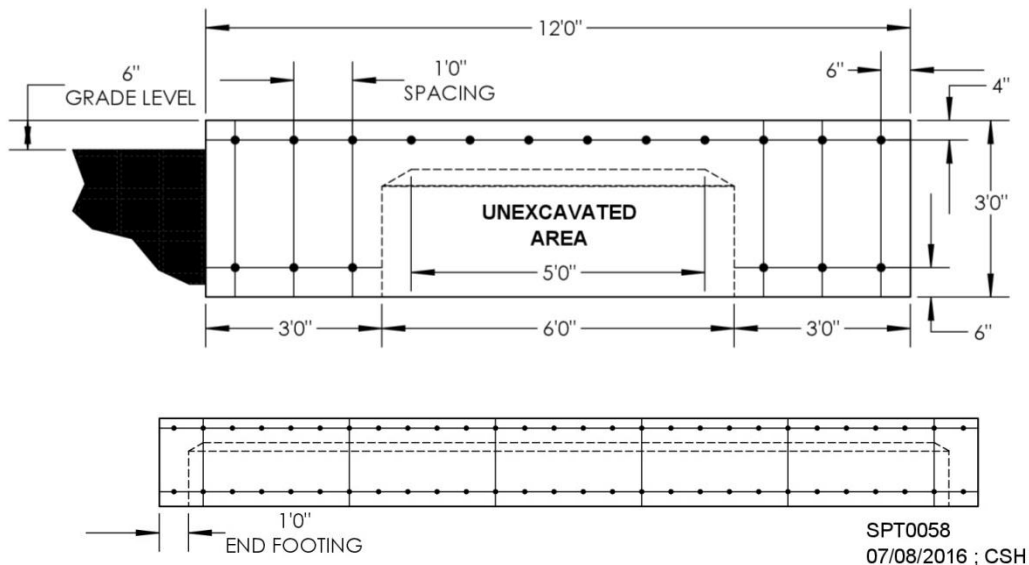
Foundation specifications for stacked centrifugal dryer
